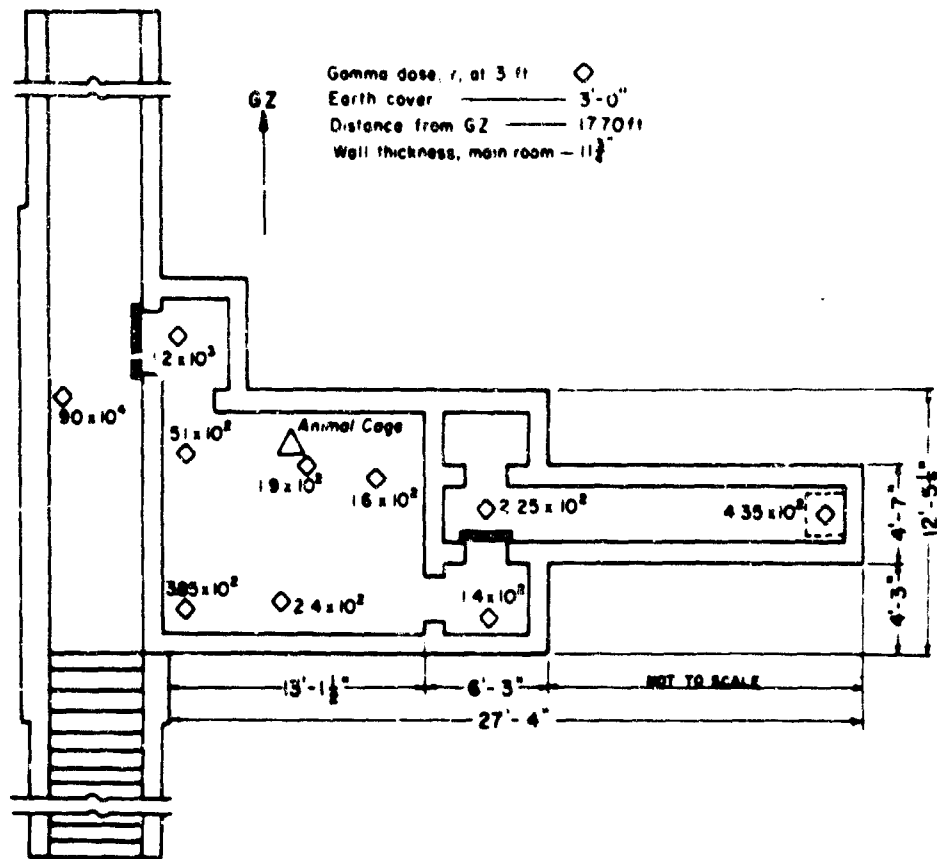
Location of Mouse cage in Shelter RCa (8-30.7-8014).
